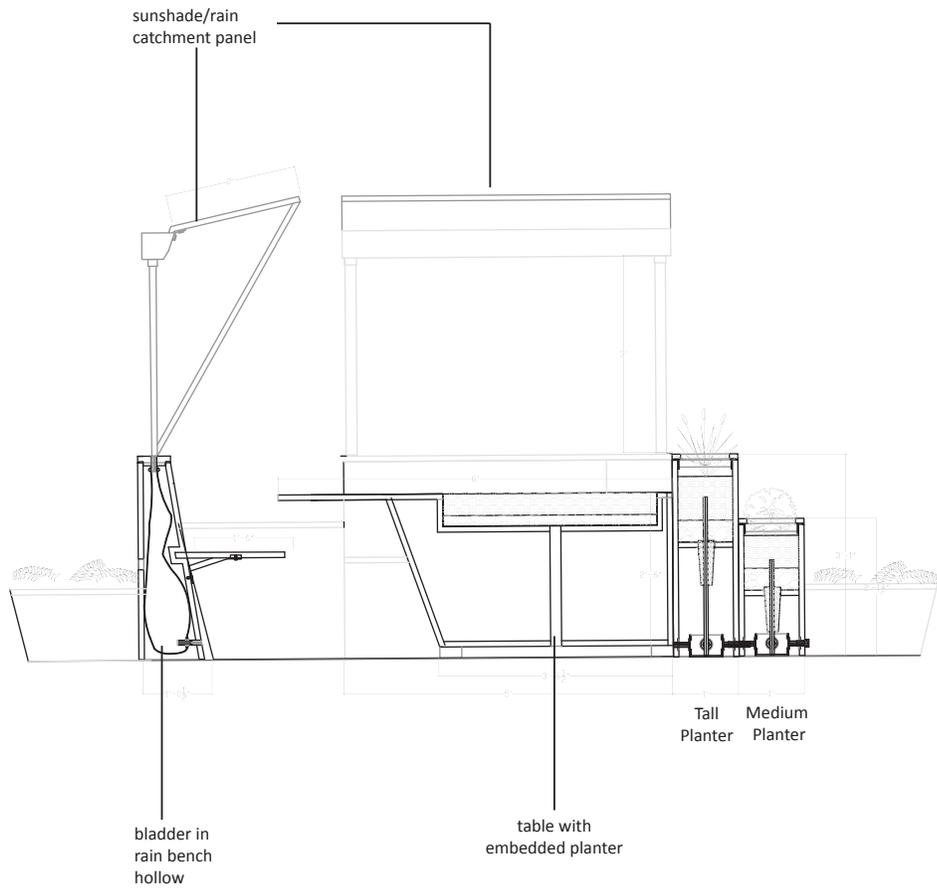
FIGURE XXXI: PATIO PLANTING PLAN FULL SUN
